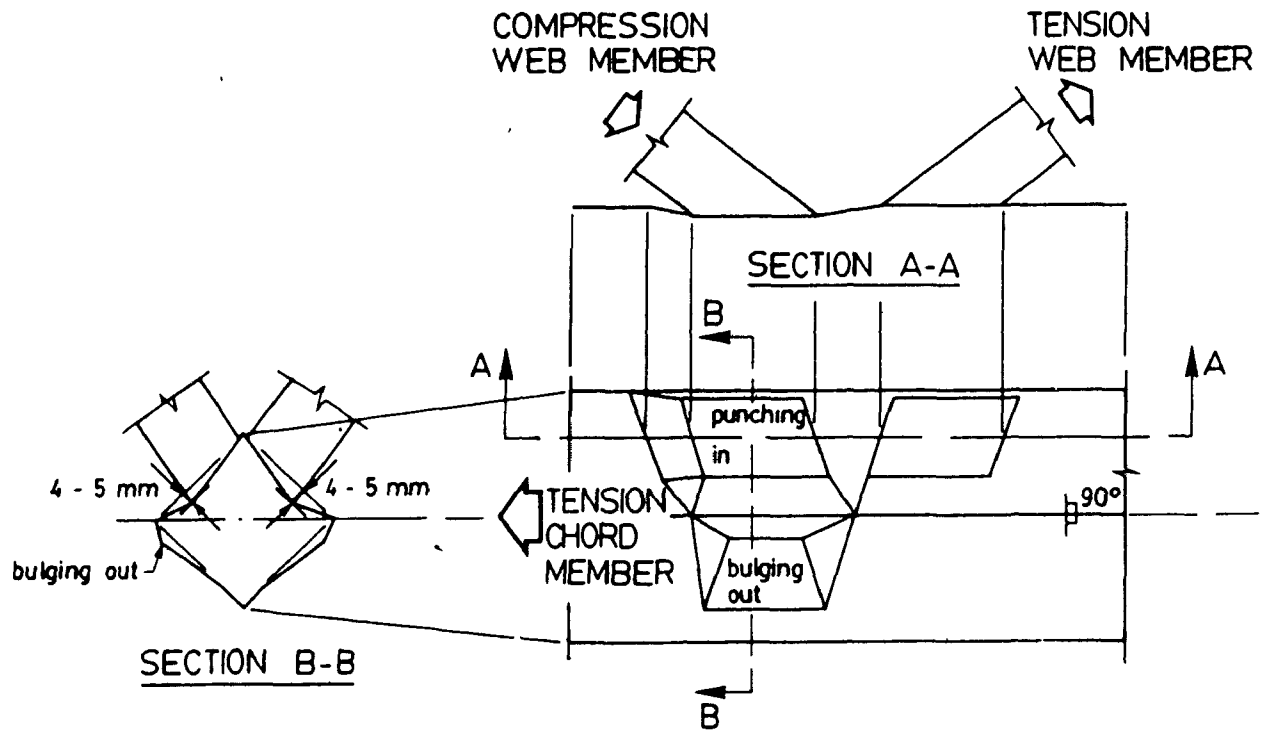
Joint deformation in Truss 4. Truss tests.
